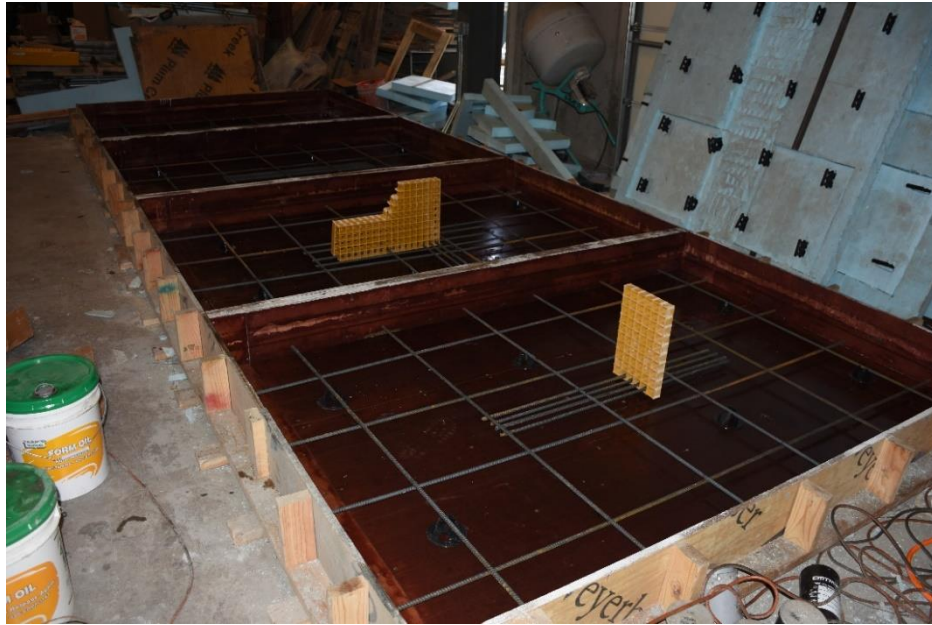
Concrete specimen formwork and rebar for Set 3
